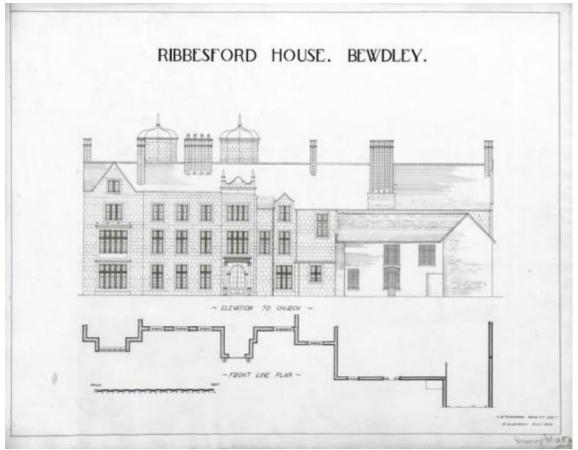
Elevation and partial plan of the house, 1933 (B&FCAA 2018)
